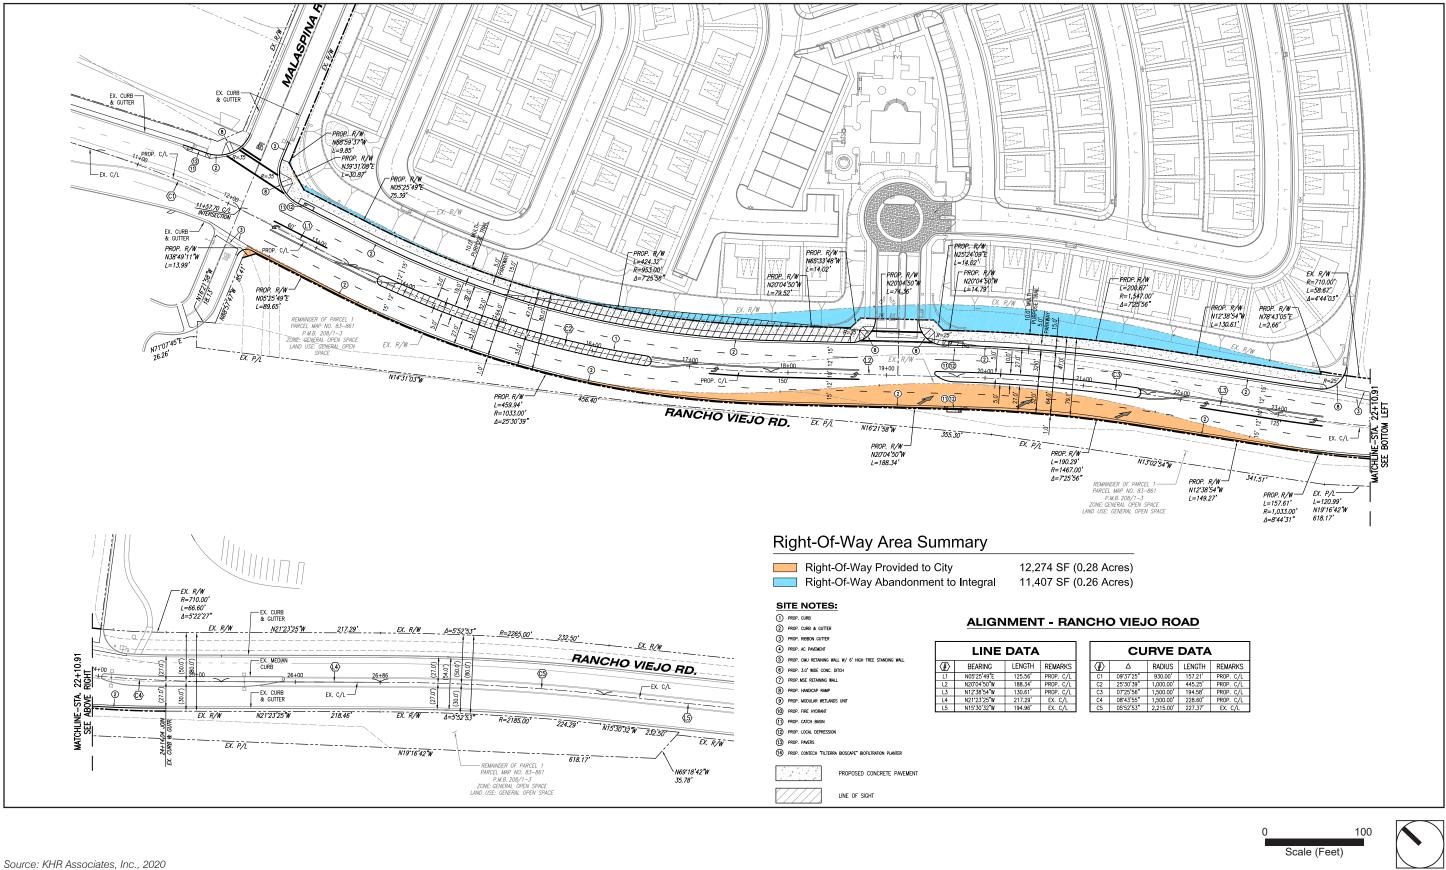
Rancho Viejo Road Street Improvement Plan 1. Introduction
